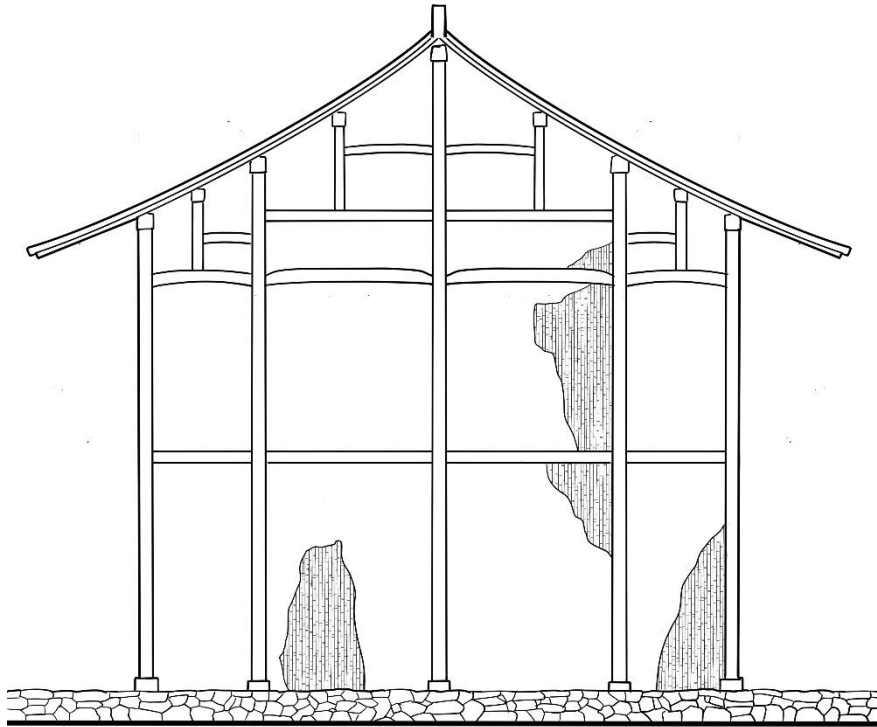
Diagram of Zhejiang vernacular houses using light straw clay for infill wall drawn by author
